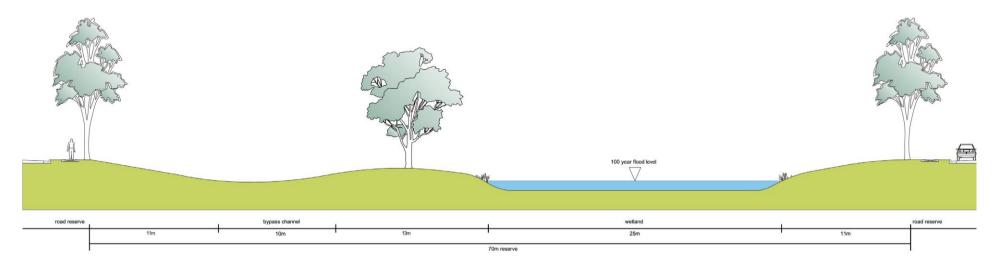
Typical Drainage Reserve and Bypass Channel Cross Section
